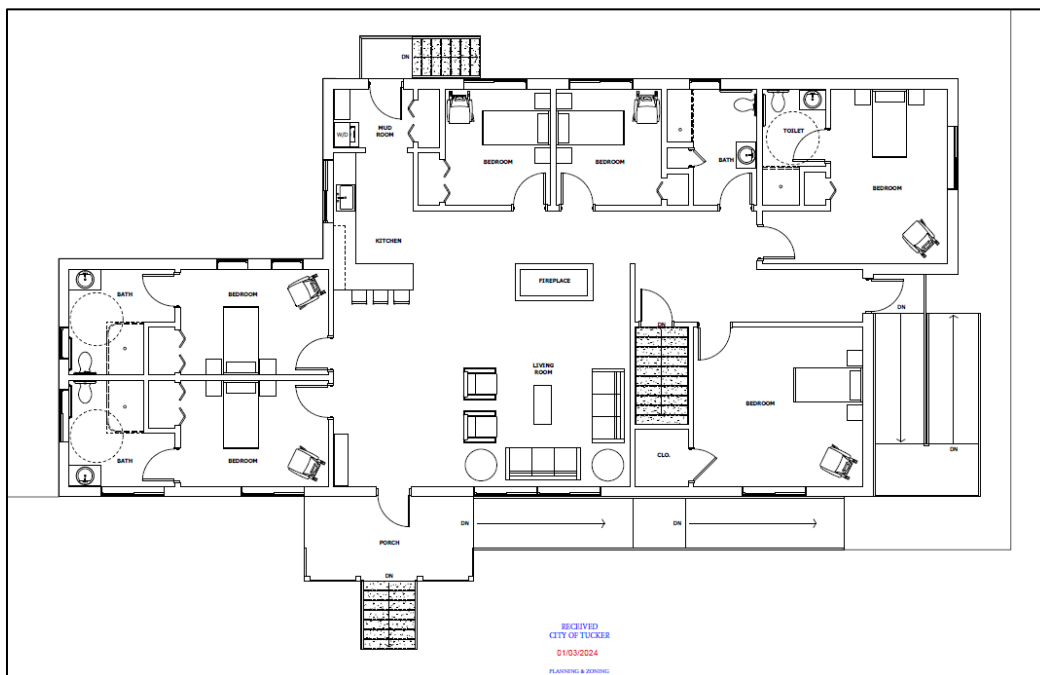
Proposed Floor Plan for 4372 Lawrenceville Highway.
